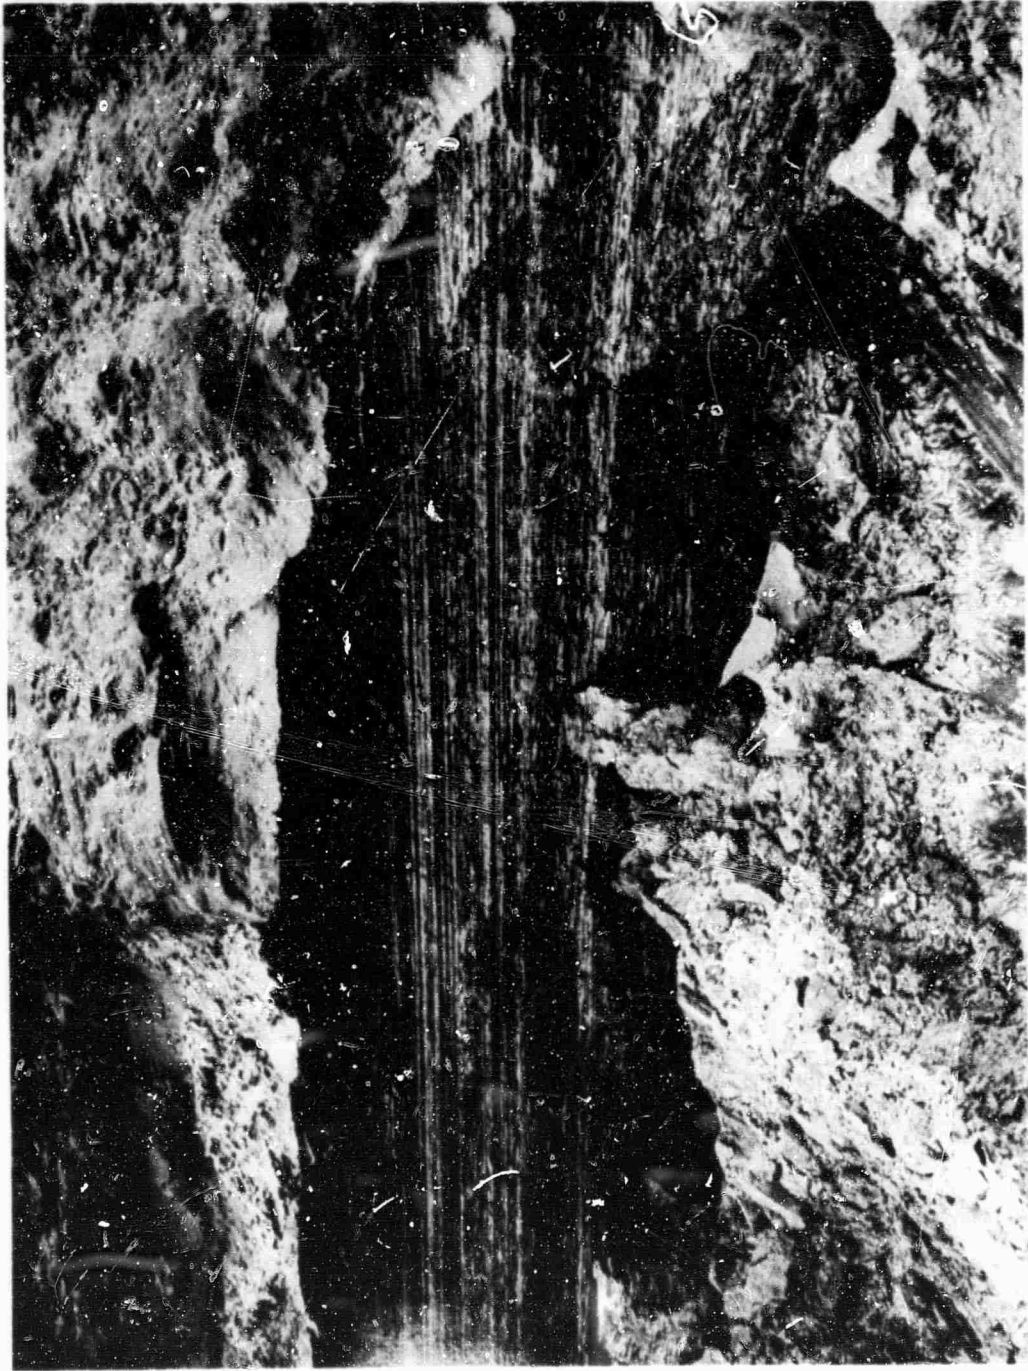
Minuteman excavation; water piping from toe of excavation and sloughing soil
